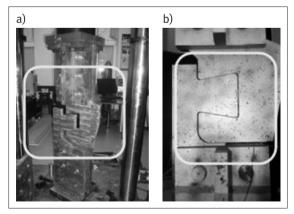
Photos of the tested components of the side lock and the test stand view with INSTRON SATEC machine: a) hook-shaped connector, b) separated component in the form of the dovetail joint
